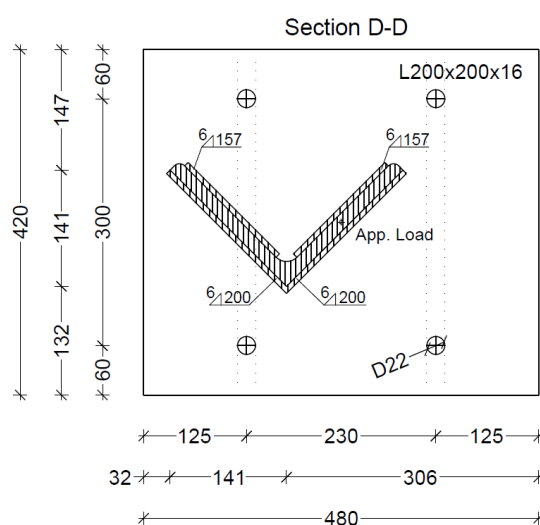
Detail of end plate in case of eccentrically load specimen
